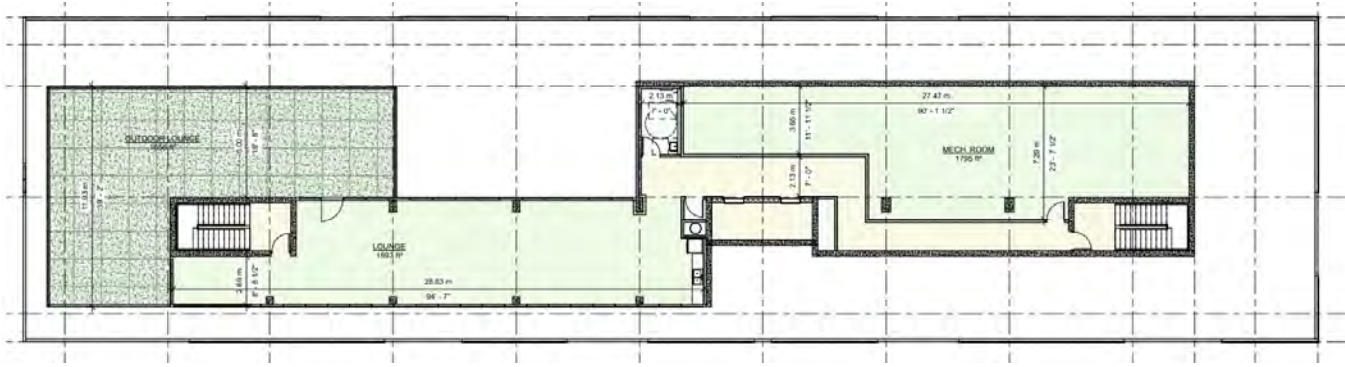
Mechanical Penthouse and Rooftop Amenity Space
